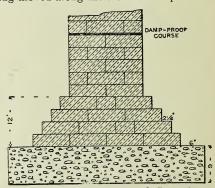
Section of Footings and Concrete under Two-brick Wall.
